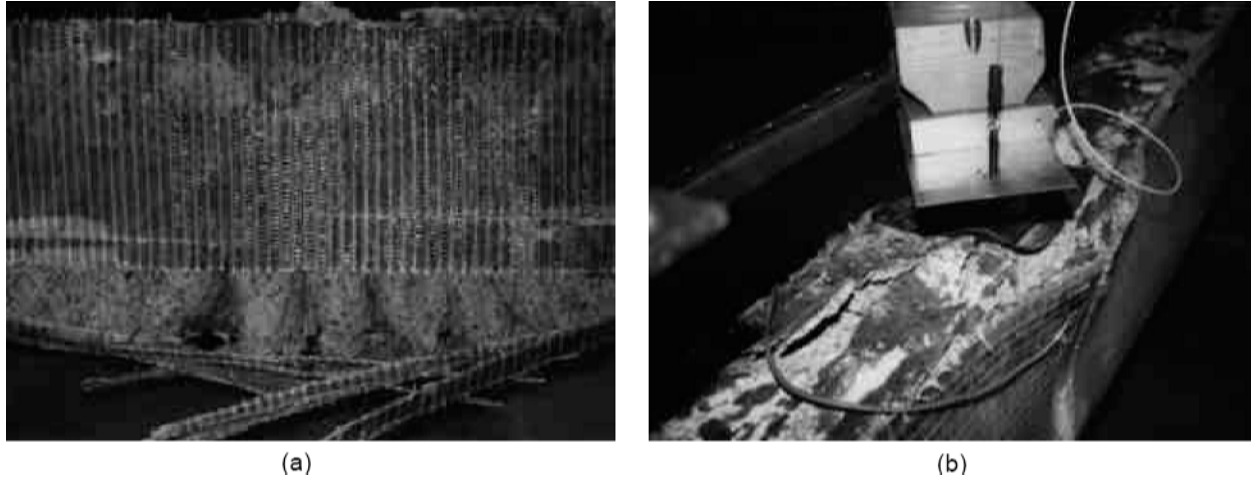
Failed section of beams (a) FRP rupture; (b) Crushing of compressive concrete (Grace et al., 1999).
